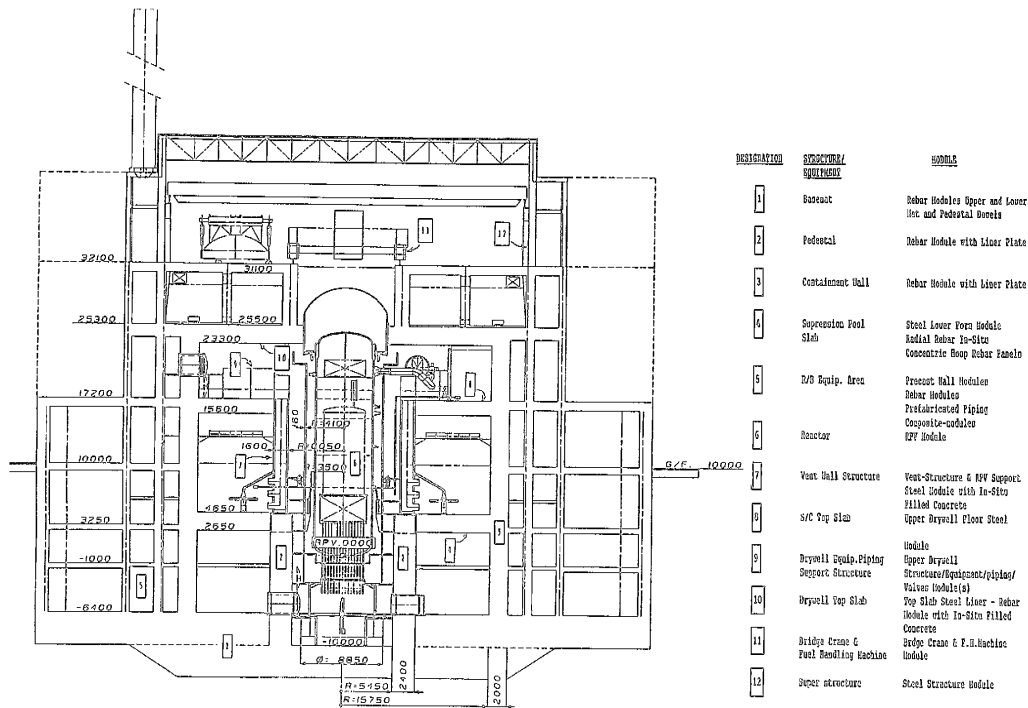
A TYPICAL SECTION OF SBWR PLANT
